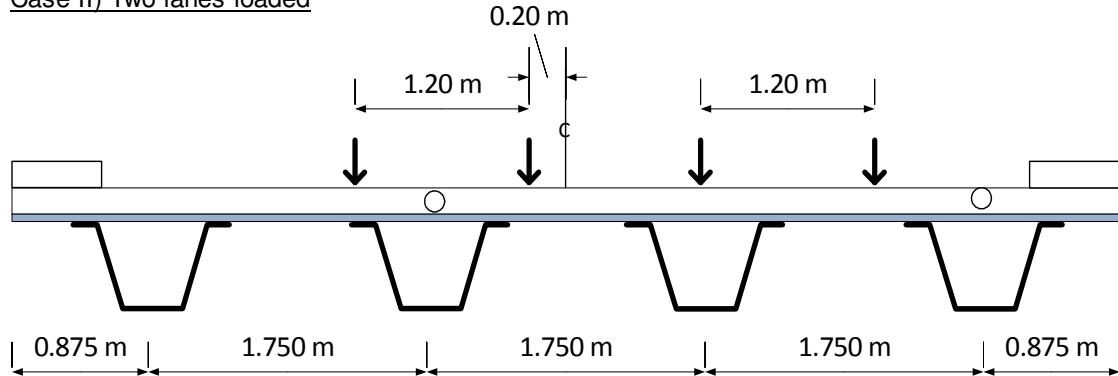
Arrangement of loads and hinges to calculate load distribution factor for internal girders
